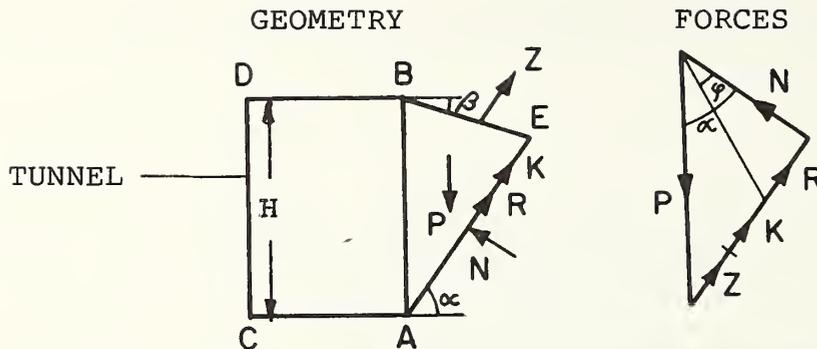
RITTER'S METHOD : WALL STABILITY
